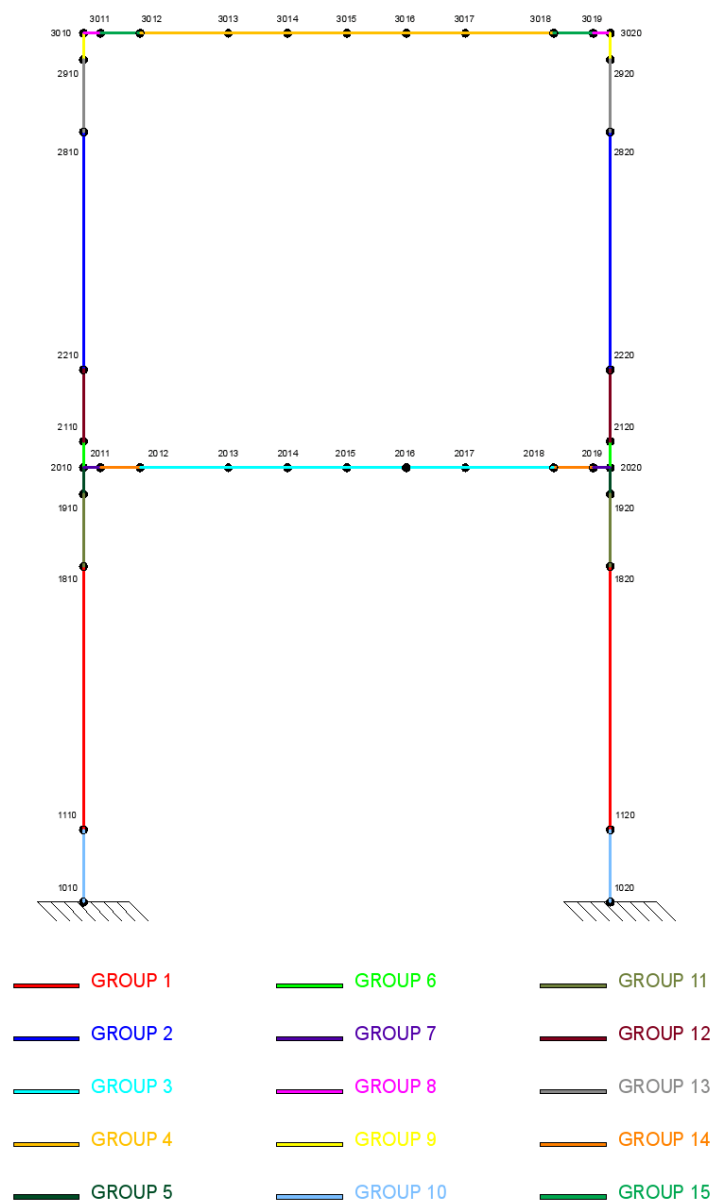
Analytical modelling of the new frame in DRAIN-3DX
